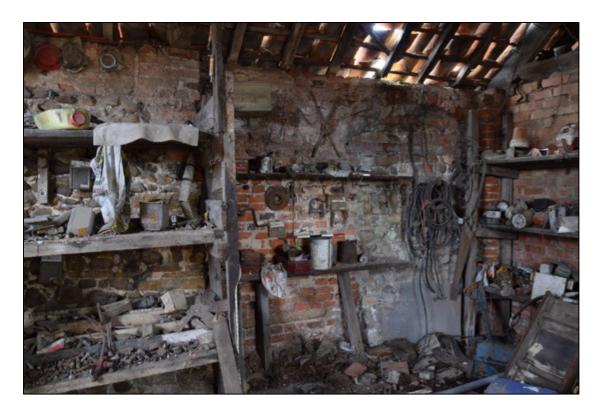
The workshop, building B. Note the similarity between the stonework here and that in the west end of the house, seen in Photo 8. Brick courses used to raise the eaves can be seen here
